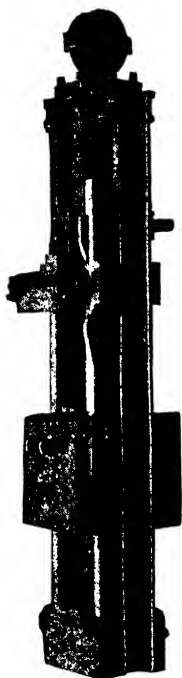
Warrington-Vulcan Steam Pile-hammer.
